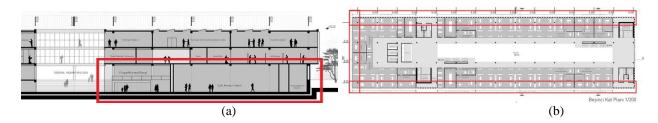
(a) Weak storey risk; Multi-purpose hall section, (b) Cantilevers of the structure
